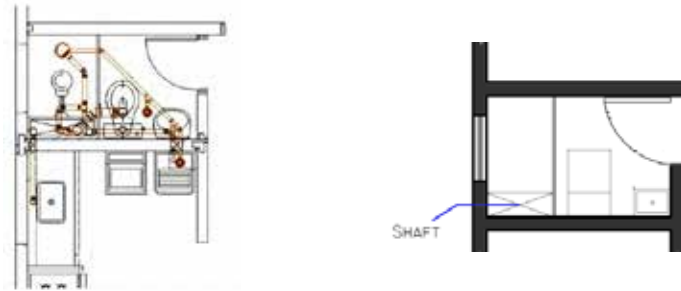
Hydrosanitary plan connections. Source: (Authors 2018)
